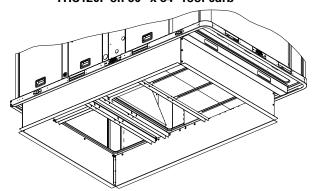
View for base to roof curb alignment YHC120F on 60" x 84" roof curb
